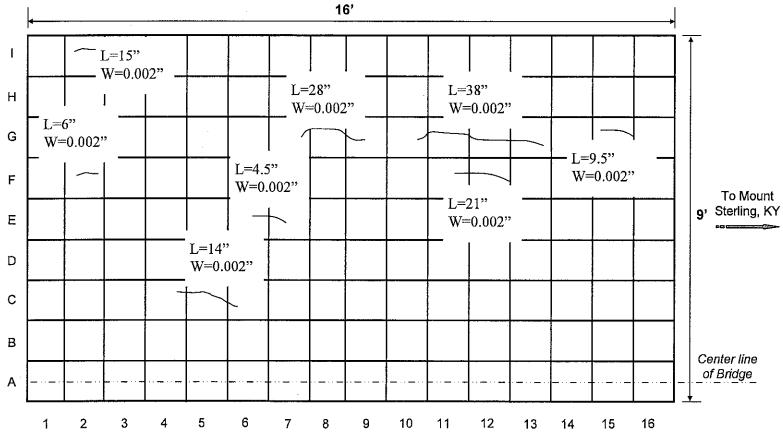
Cracks observed in the top surface of the bridge deck in the steel area under loaded conditions
